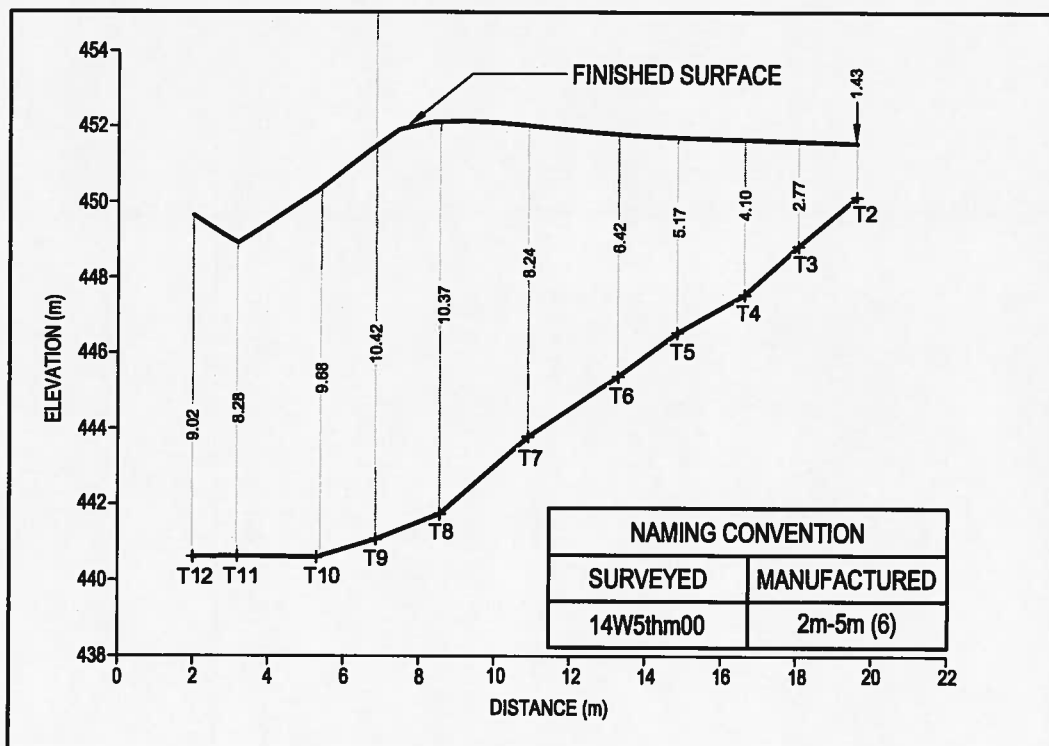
14W5thm00 (2m-5m (6)) - AS MANUFACTURED, PLAN, AND SECTION
